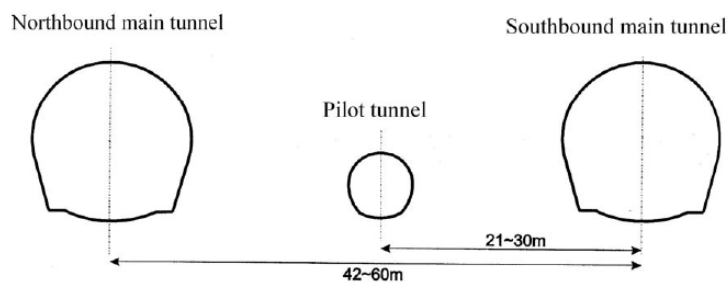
The cross section layout of the Hsuehshan Tunnels
